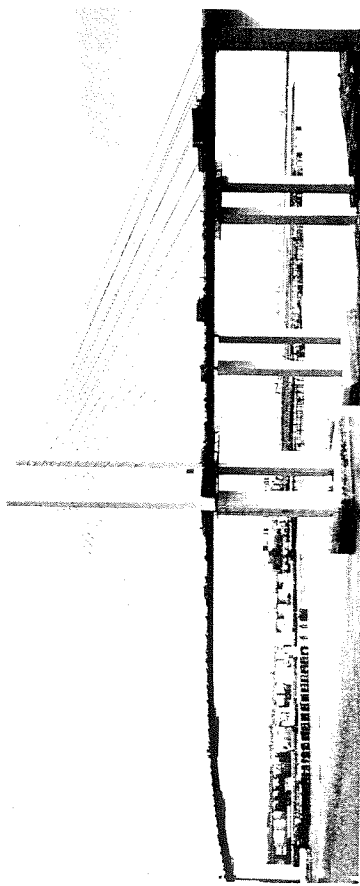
The cable-stayed bridge at Dartford, Kent, UK.
